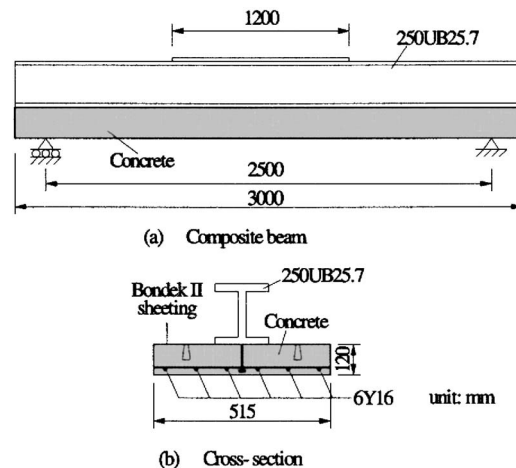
Simply supported composite steel-concrete in hogging bending beam tested by Loh et al. (2004)
